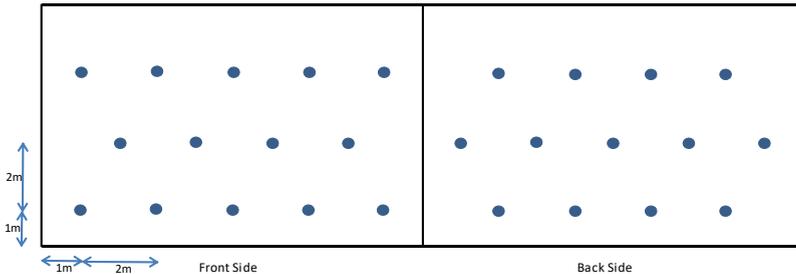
Placement of external vibrators for wall thickness more than 150 mm
